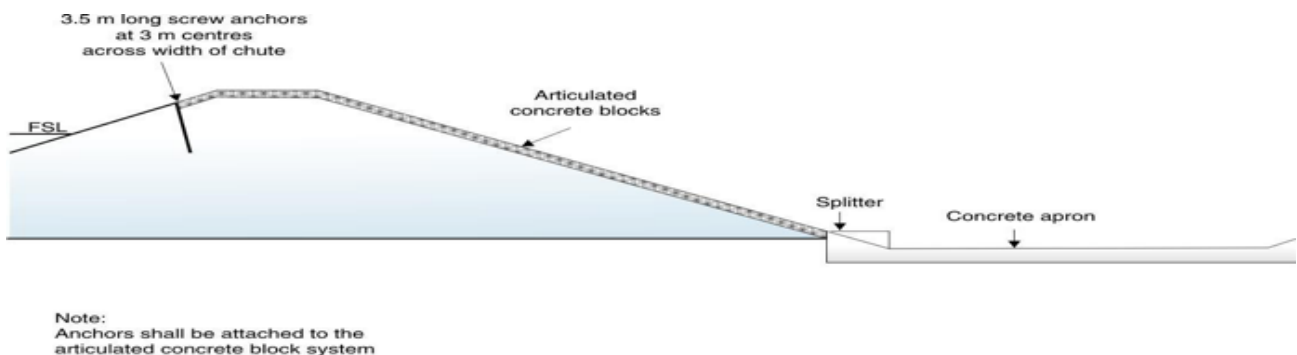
6: Dam overtopping protection with the acb system and the downstream concrete chute blocks. (Anderson and henrich/2005)
